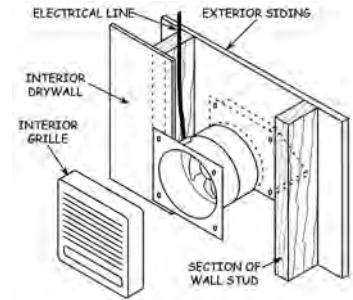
WALL VENT OPENING ADJACENT TO STUD
